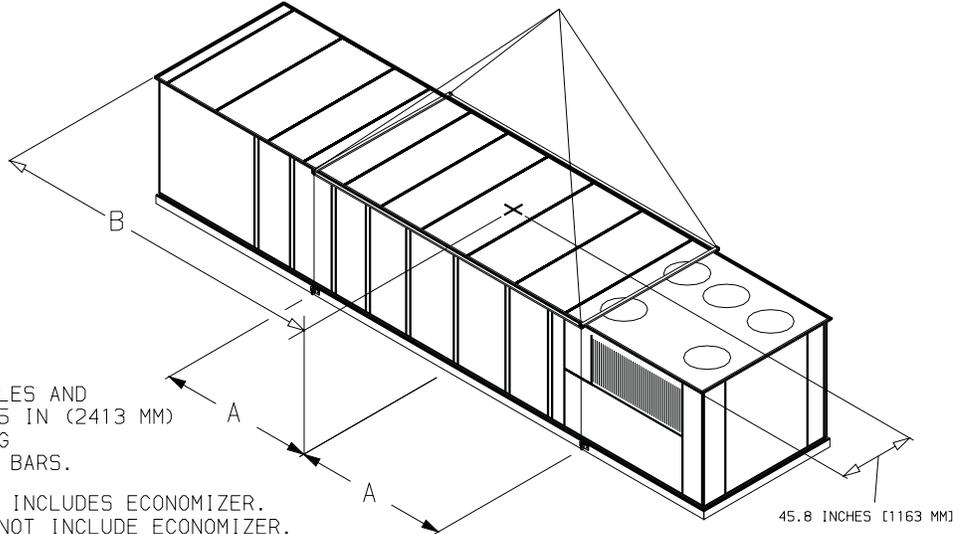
Rigging Label — Size 030-050 Units (Extended Chassis)
